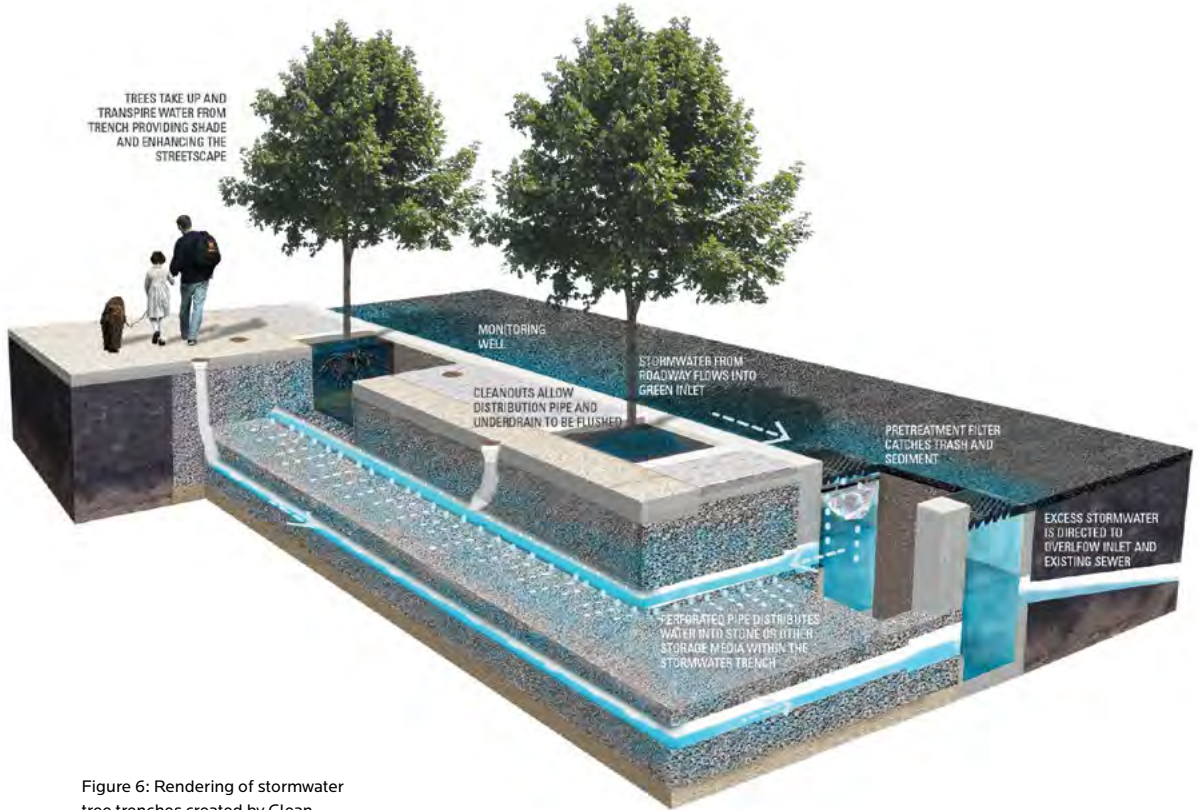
Rendering of stormwater tree trenches created by Clean Water, Green Cities Plan. Source: Philadelphia Water Department
